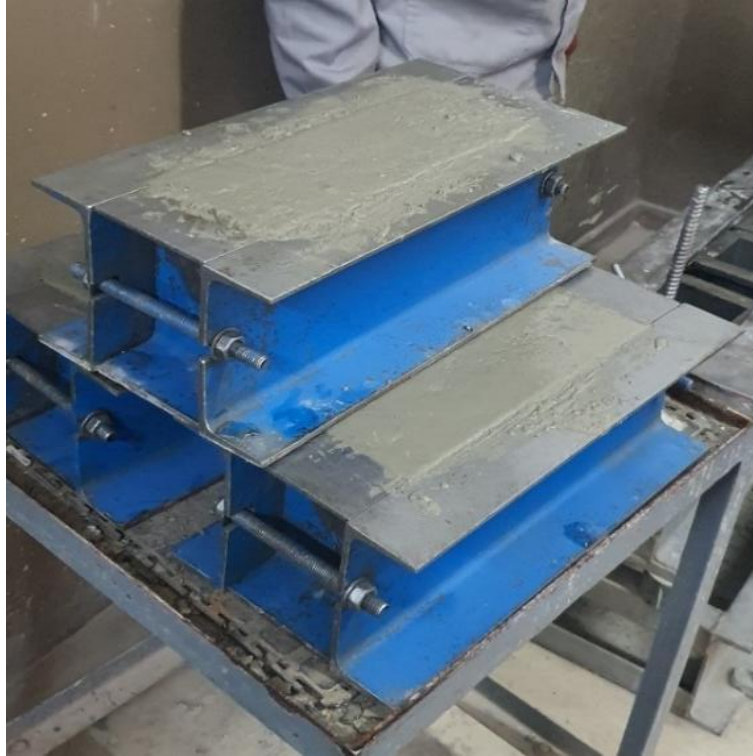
Concrete specimens measuring 100mm x 100mm x 300mm being cast from the prepared concrete mix for dry shrinkage test.
